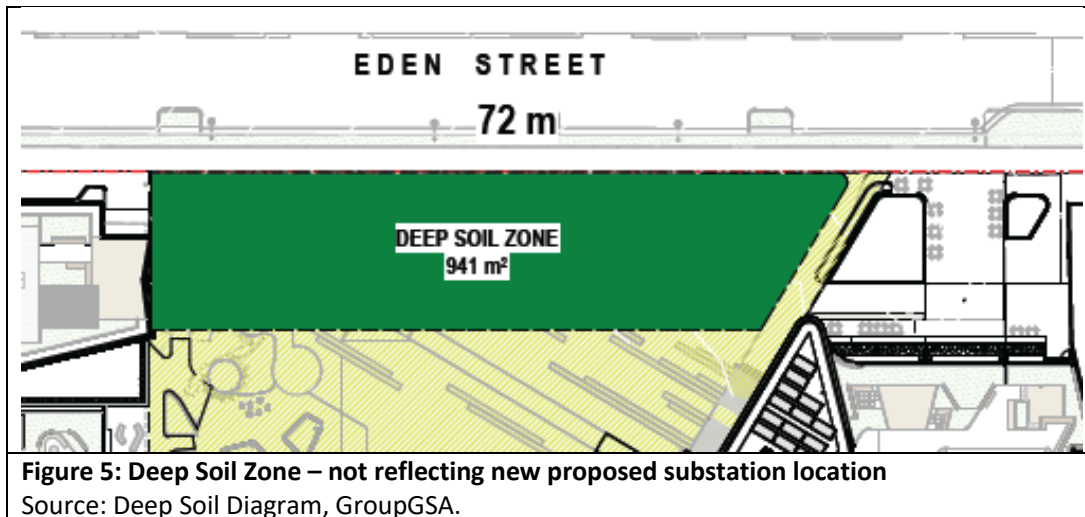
Deep Soil Zone – not reflecting new proposed substation location
